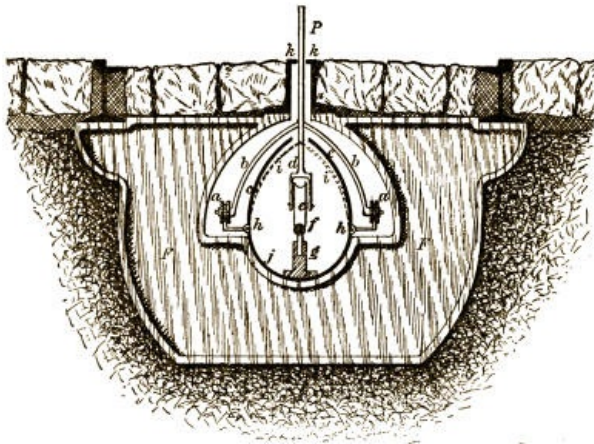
UNDERGROUND CONDUIT WITH PROTECTING SHIELD FOR THE CONDUCTOR.
